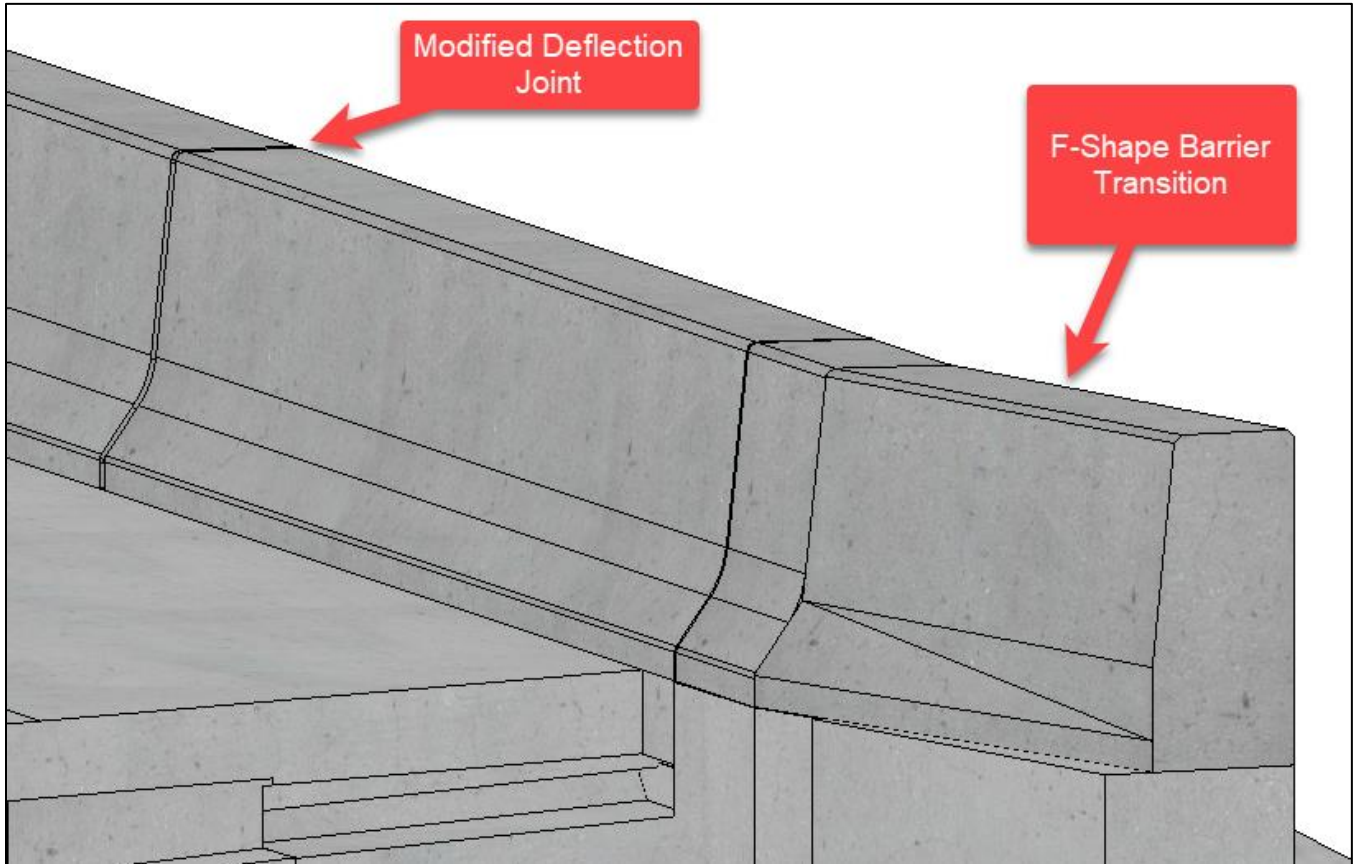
Modified Deflection Joint and F-Shape Barrier Transition Example
